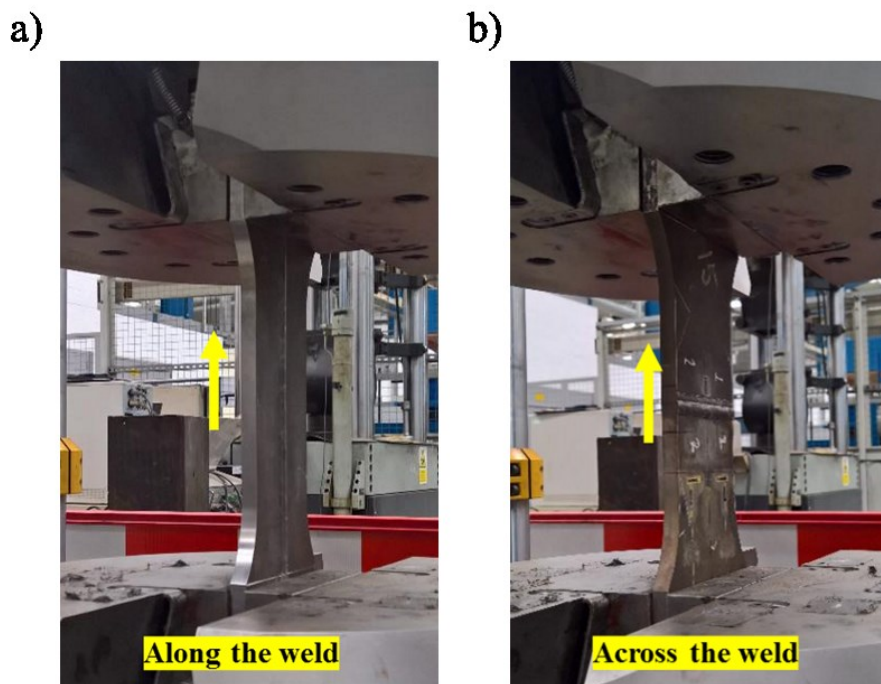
Photograph of the set-up used for the cyclic loading of butt welded plates: a) Butt-welded plate with the long weld and, b) butt-welded plate with the short weld.
